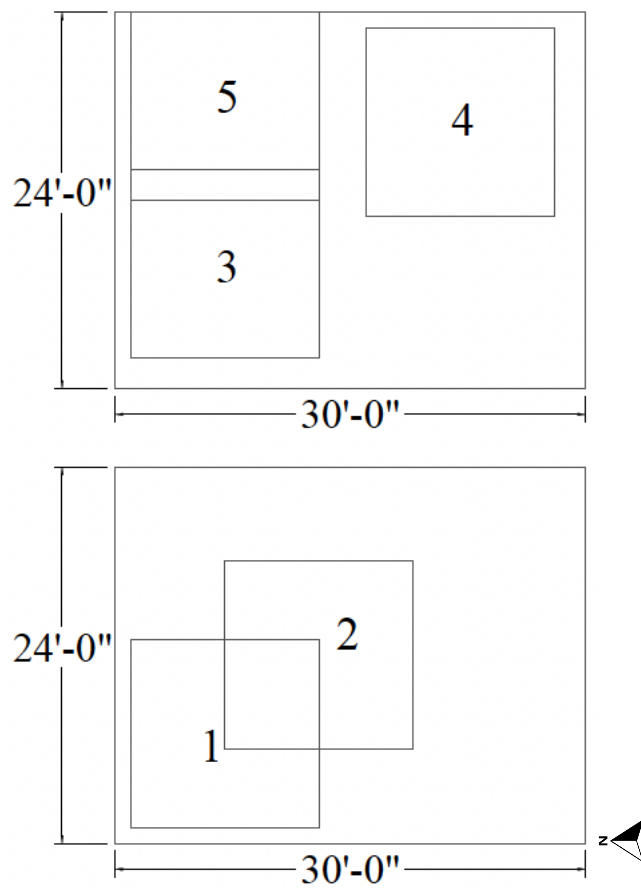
Normal-weight concrete approach slabs at bridge C-989.
